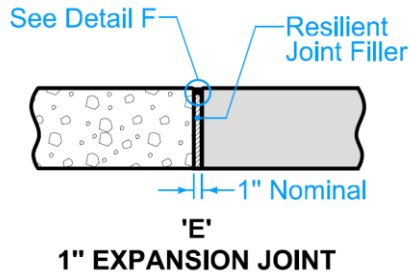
Iowa DOT "E" Joint (Iowa DOT)
